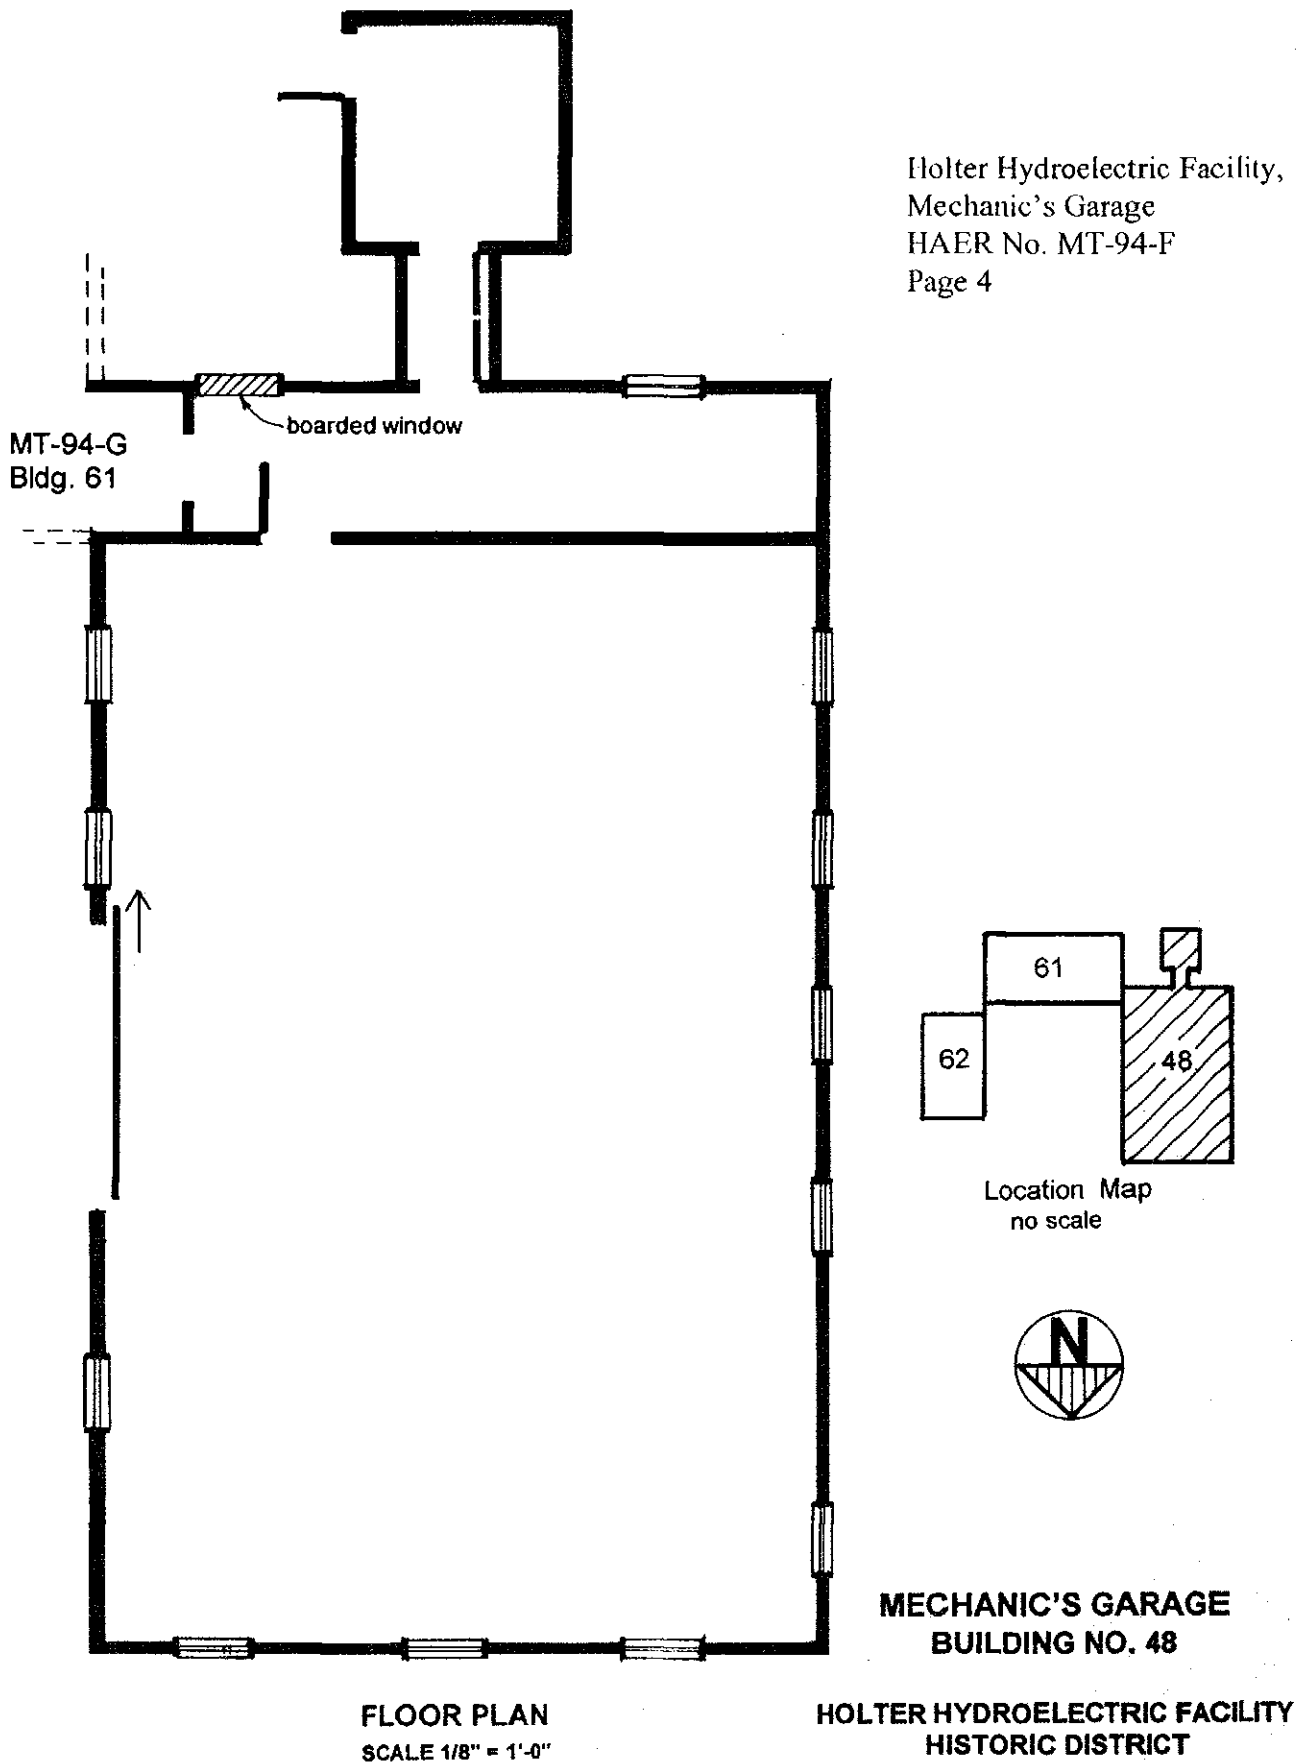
Mechanic's Garage (Building No. 48) Floor Plan.
